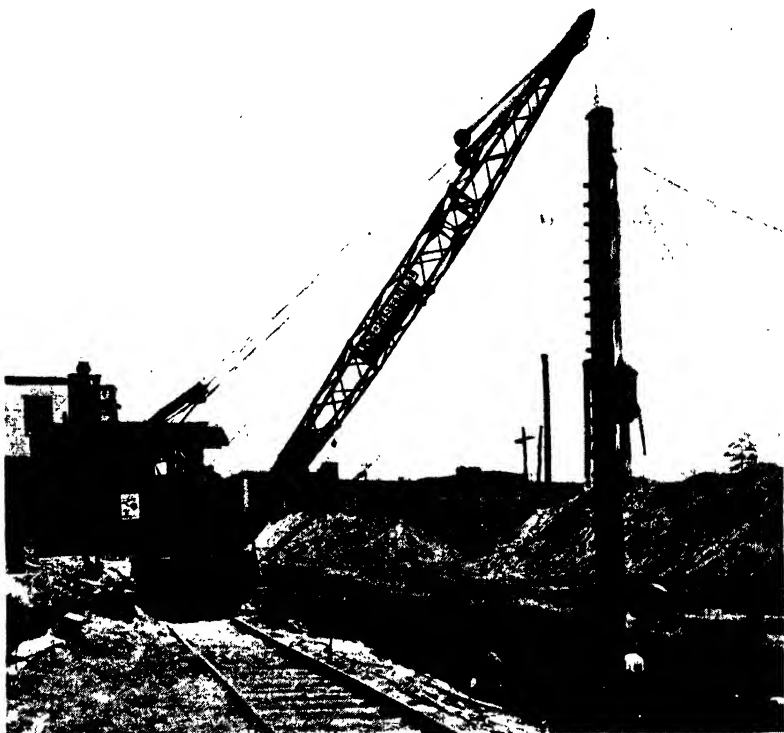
Extracting sheet piling with heavy block and tackle and mast resting on adjacent piling.
